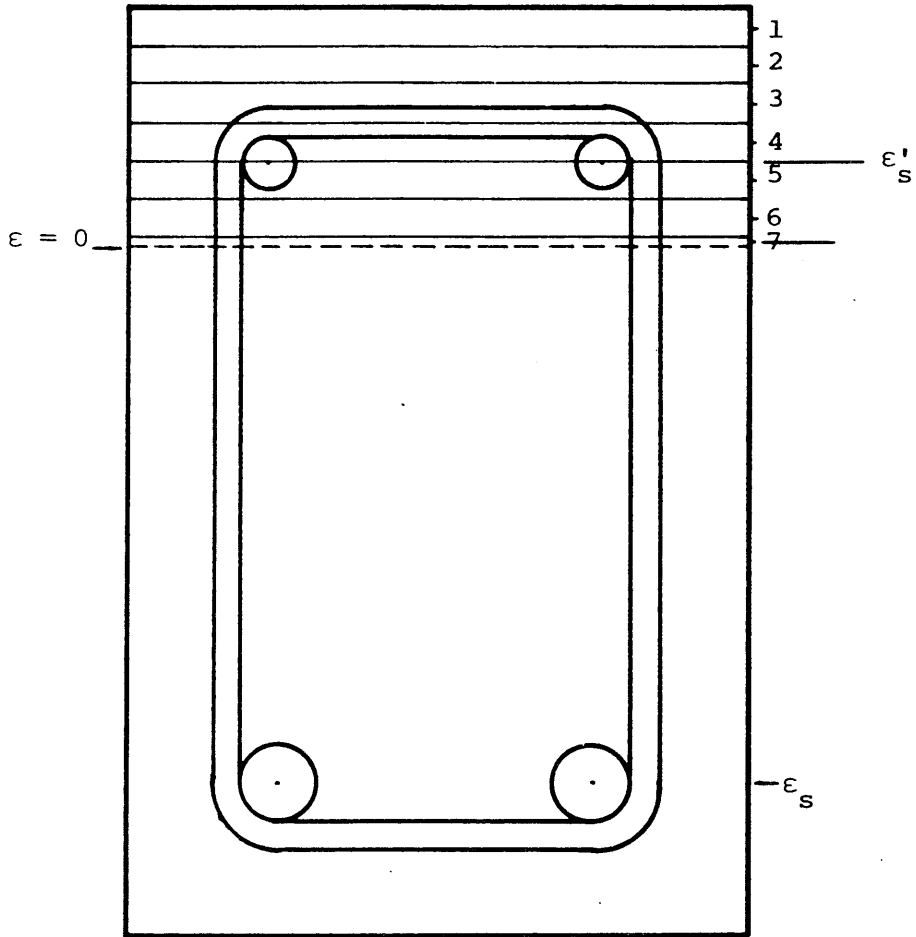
Beam J-2 cross section for Case 7.
